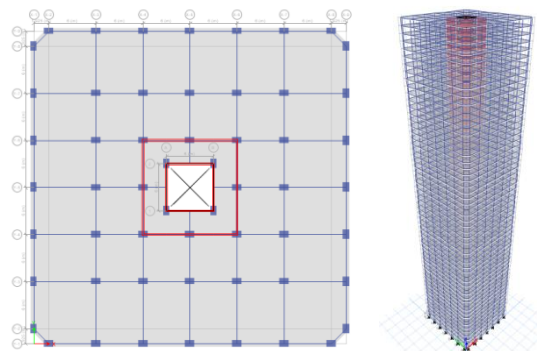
Plan and 3D Elevation for Shear Wall Structure
